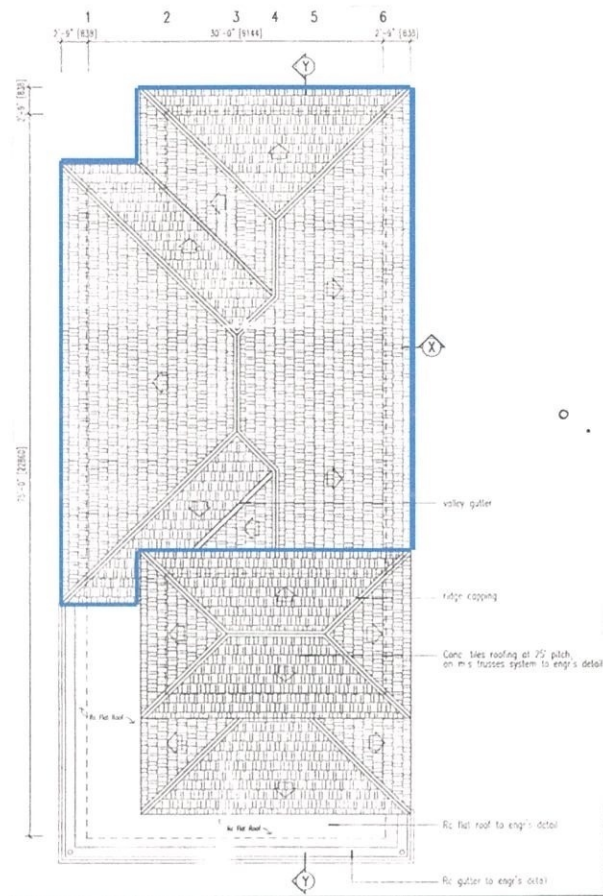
Roof Plan of Bungalow House in Taman Dato' Wan, Ampangan
